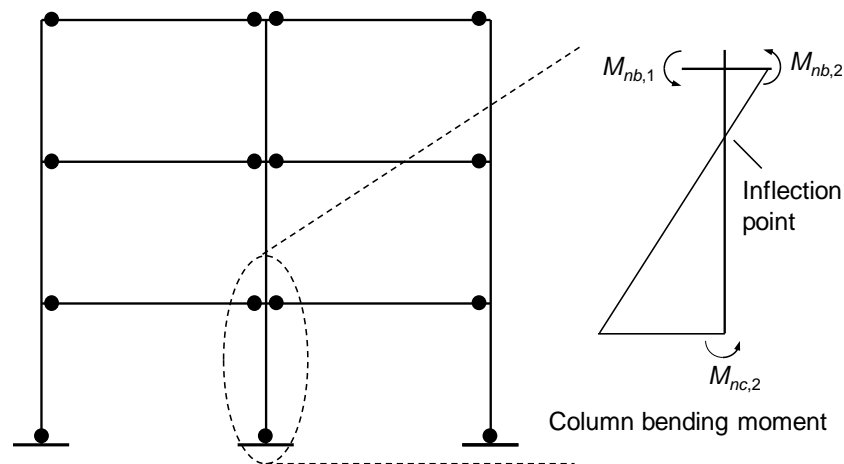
Beam-sway mechanism and column flexural strength in the first floor
